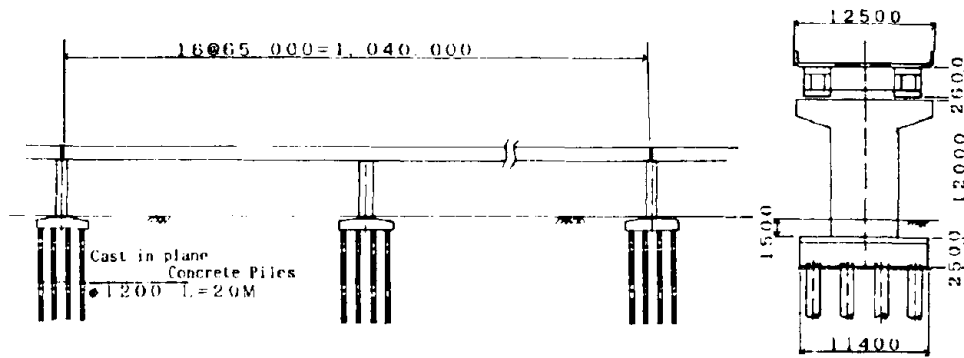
Multi-Span Bridge with 1 kilometer Continuous Steel Girder
